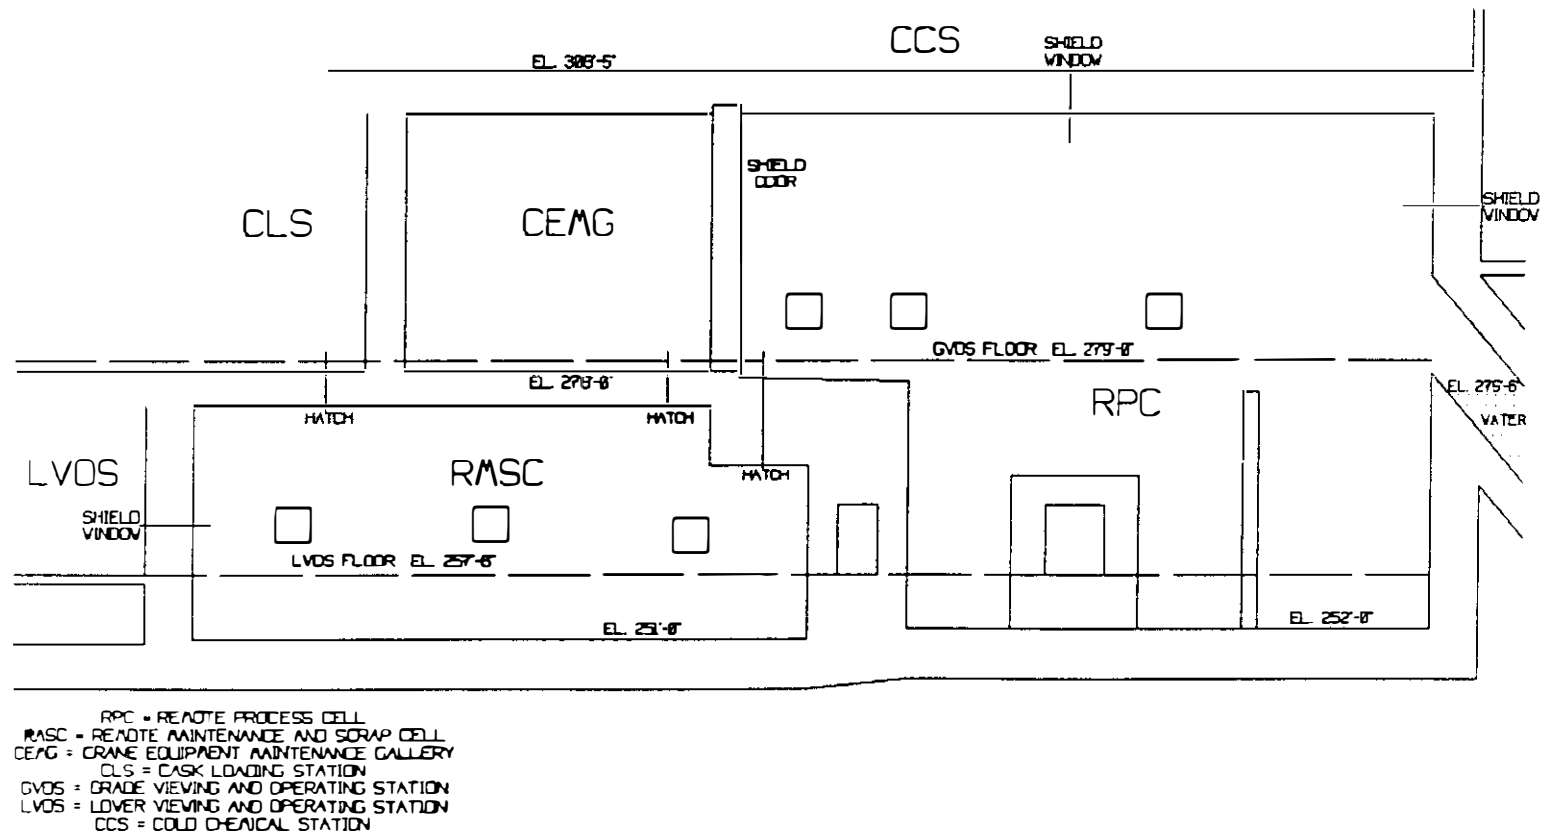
Elevation looking north in the Barnwell Plant fuel handling area.
